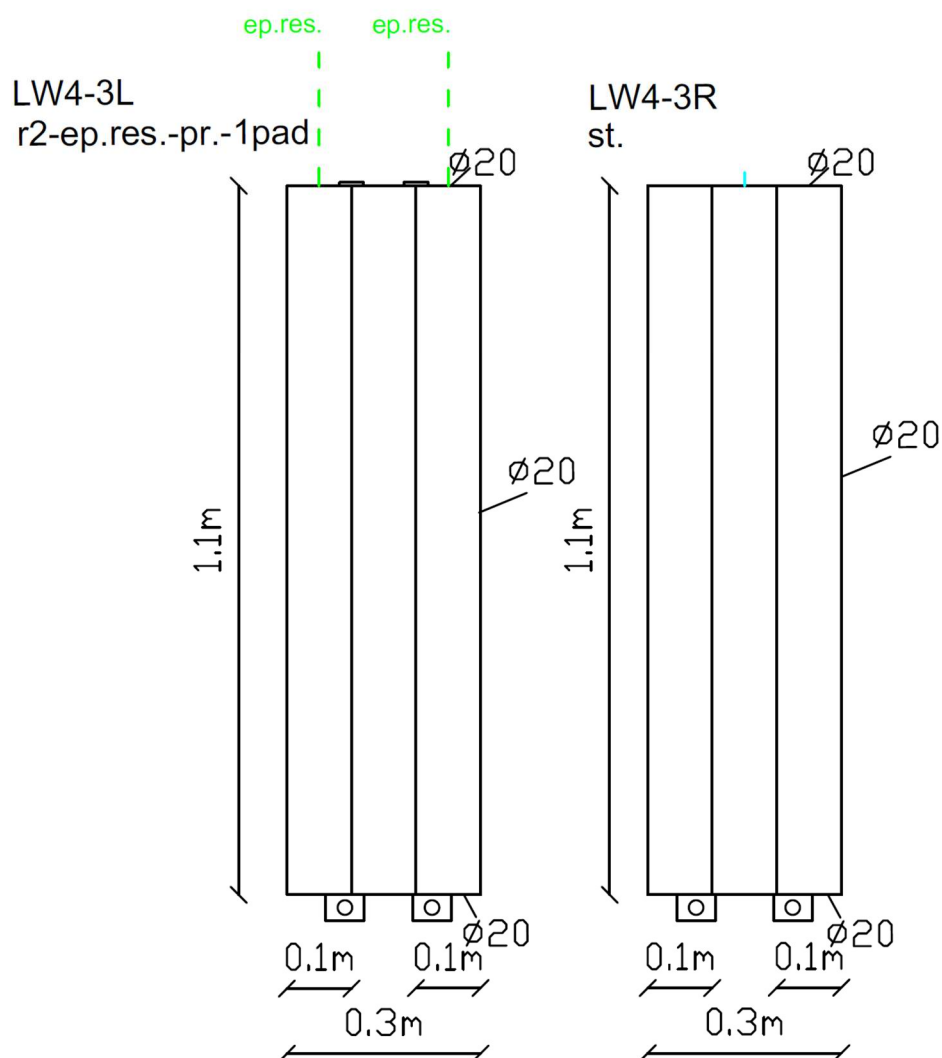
Living wall 4-3 left side and living wall 4-3 right side
